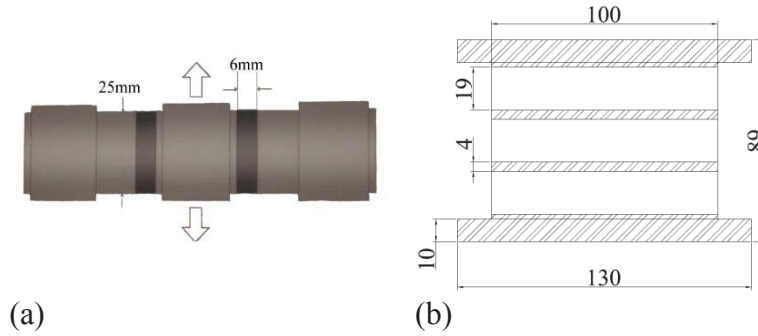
(a) Double shear test piece geometry, (b) Elastomeric bearing geometry
